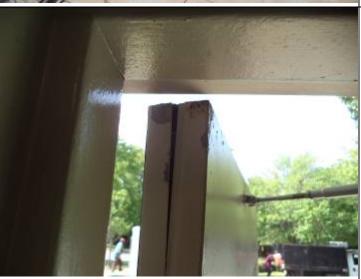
The entry door at the pool house is damaged where the metal is splitting. This should be sealed to retard deterioration.
